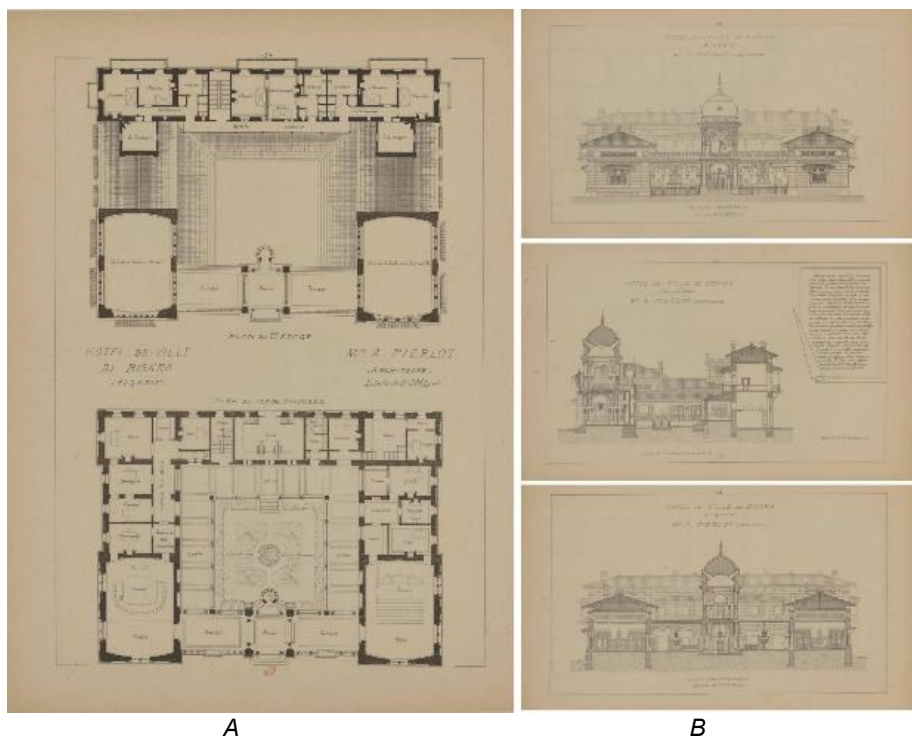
Graphic drawings of the city hall of Biskra: A) plans of the ground and first floor; B) above, the main façade, and below, two sections [56].
